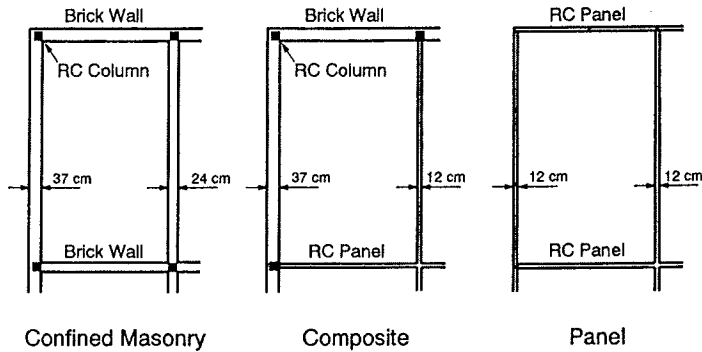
Wall configurations of the apartment buildings employed in the reconstruction from the Tangshan earthquake.
